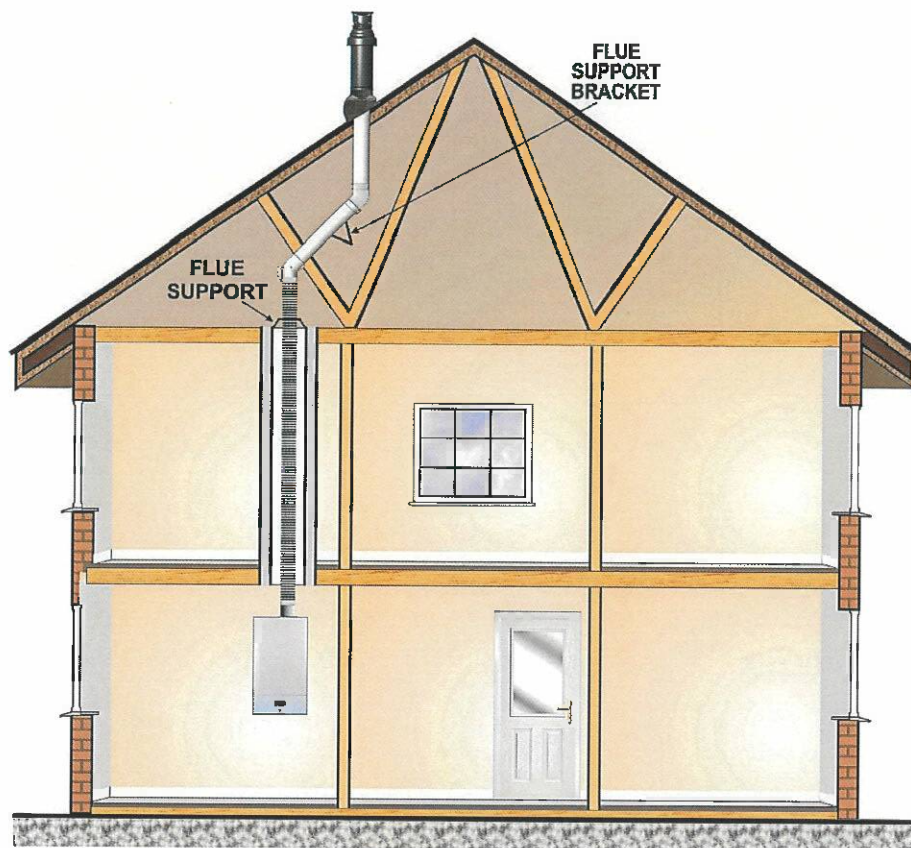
Flexible chimney system from boiler through a void and traditional chimney system in a roof space. Check manufacturer's literature to see if this installation arrangement is approved.
